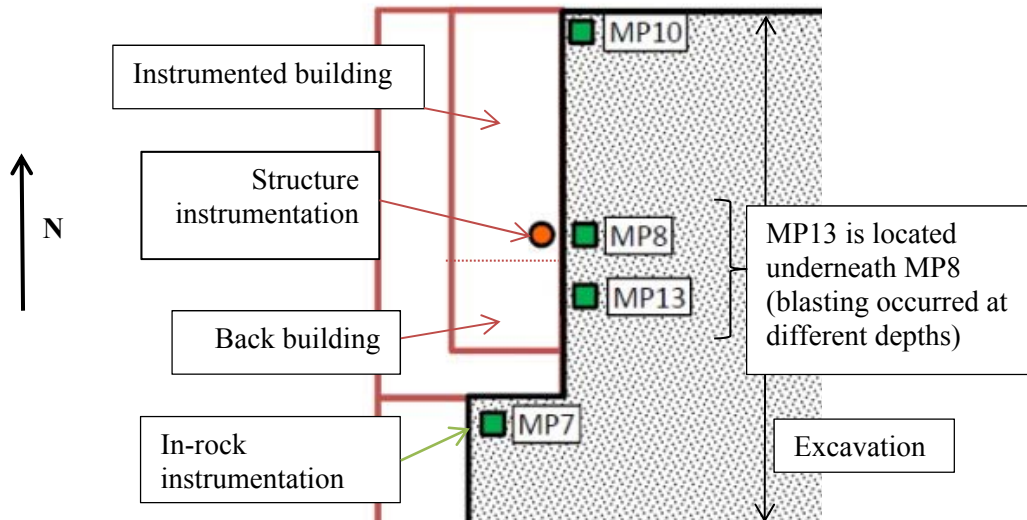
Plan view of the excavation and location of the various measurement points and the building instrumentation
